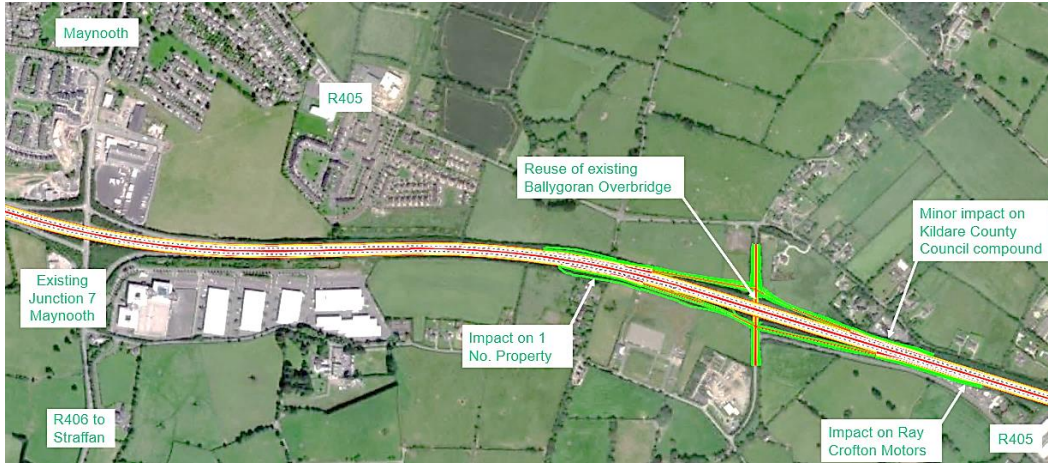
Location E - Junction reusing Existing Ballygoran Overbridge
